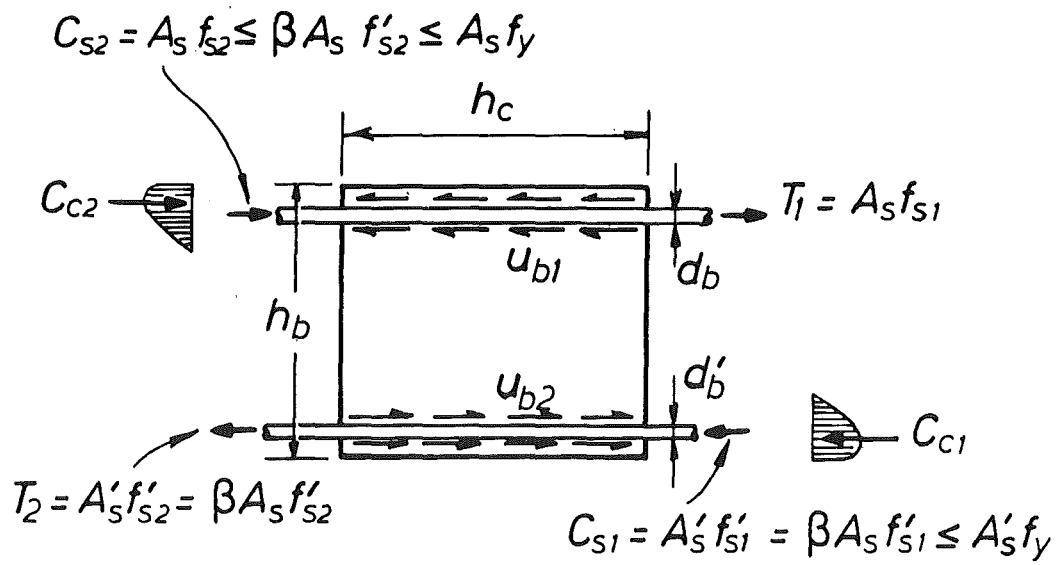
Horizontal steel, concrete and bond forces at an interior joint due to beam moments only
